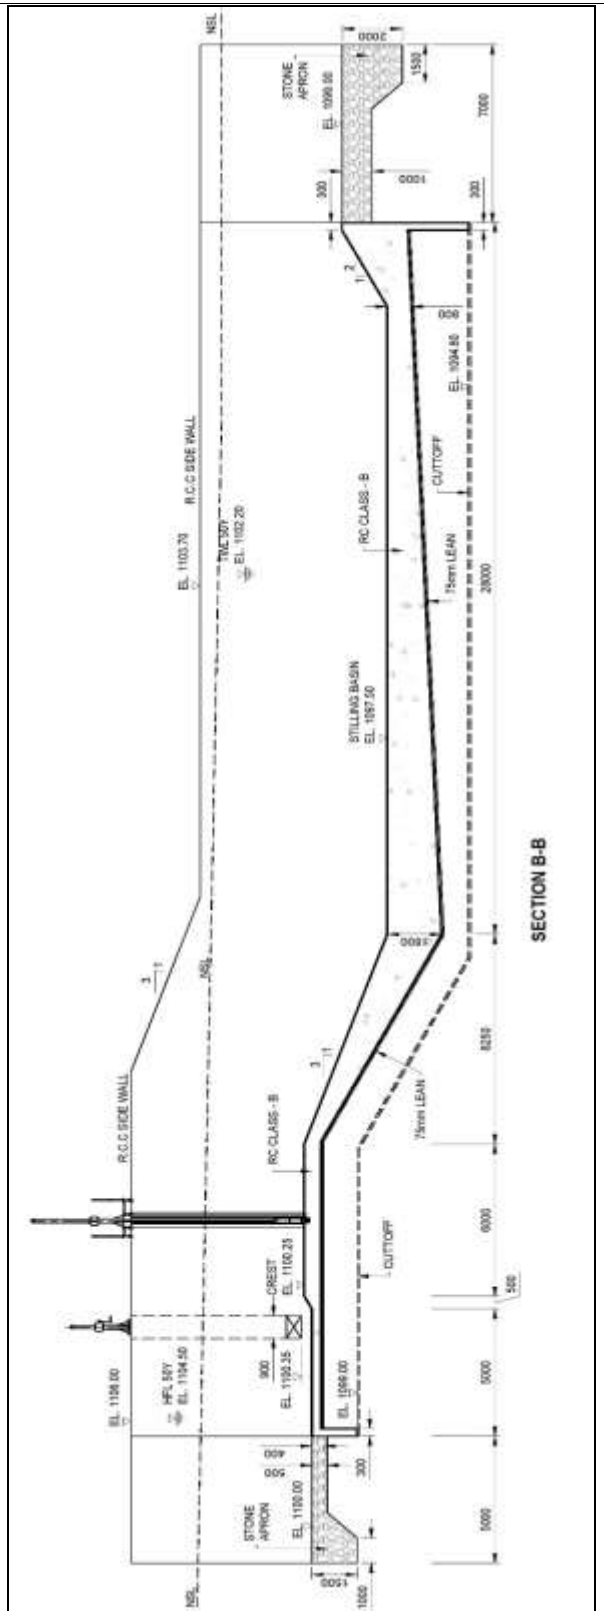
Longitudinal Section of Pashta Khan Weir Under Sluice
